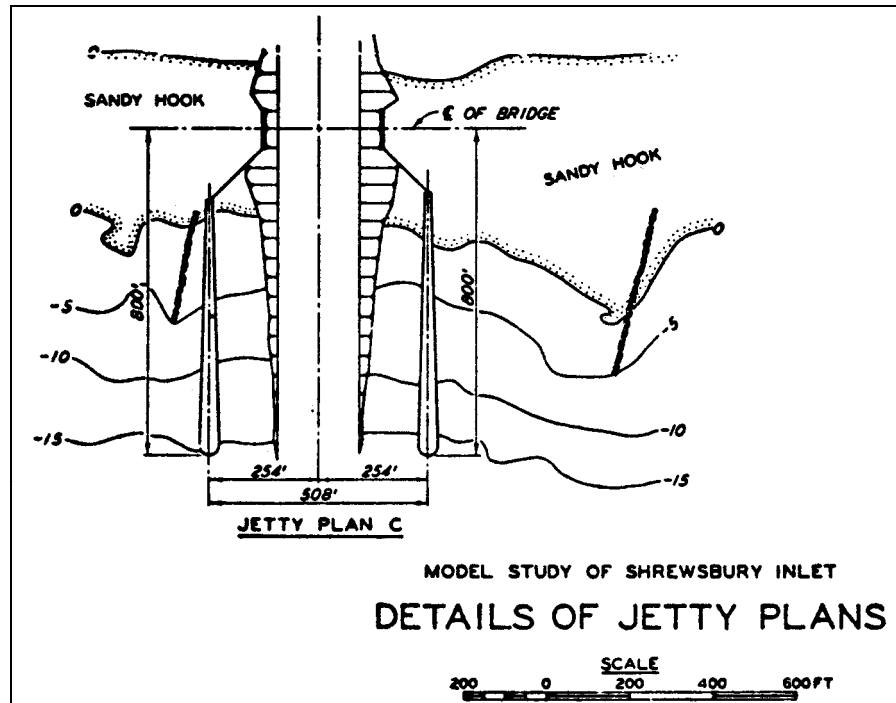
Details of jetty plans, Shrewsbury Inlet.
